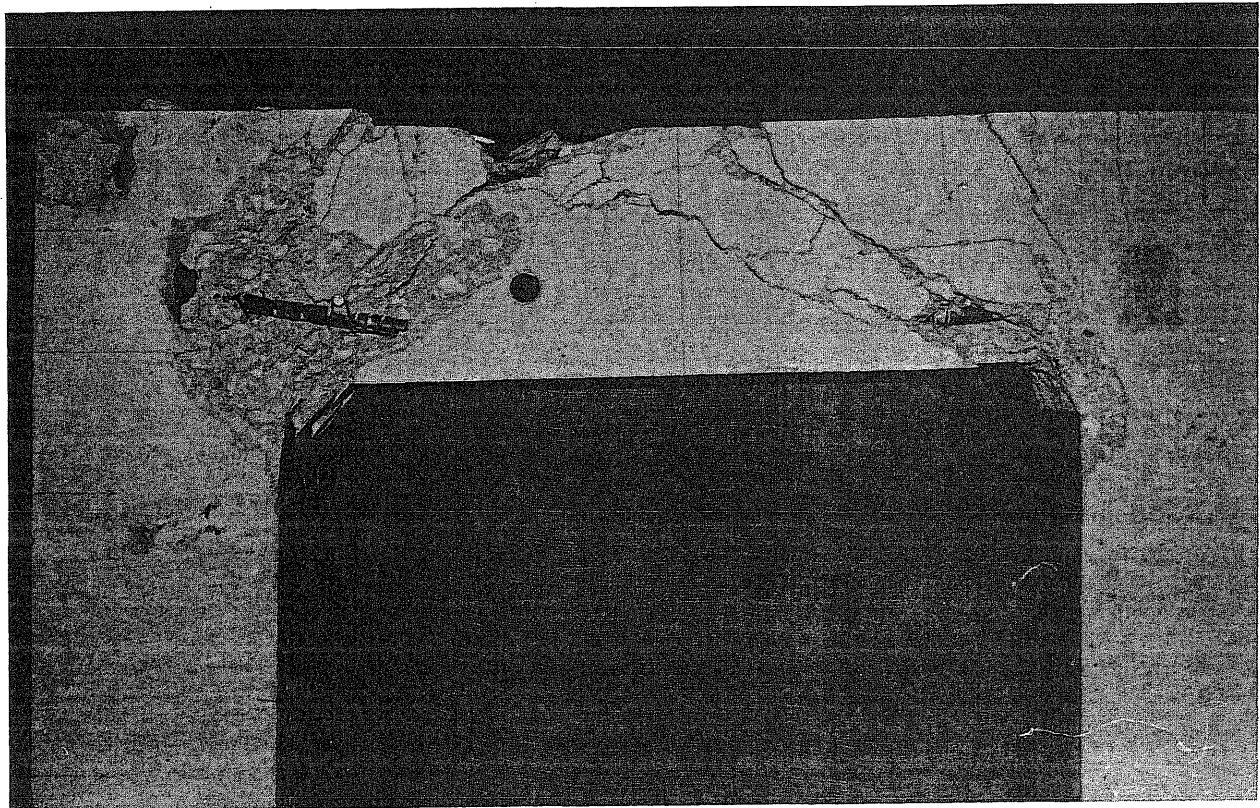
FAILED HORIZONTAL MEMBER, SPECIMEN R3
